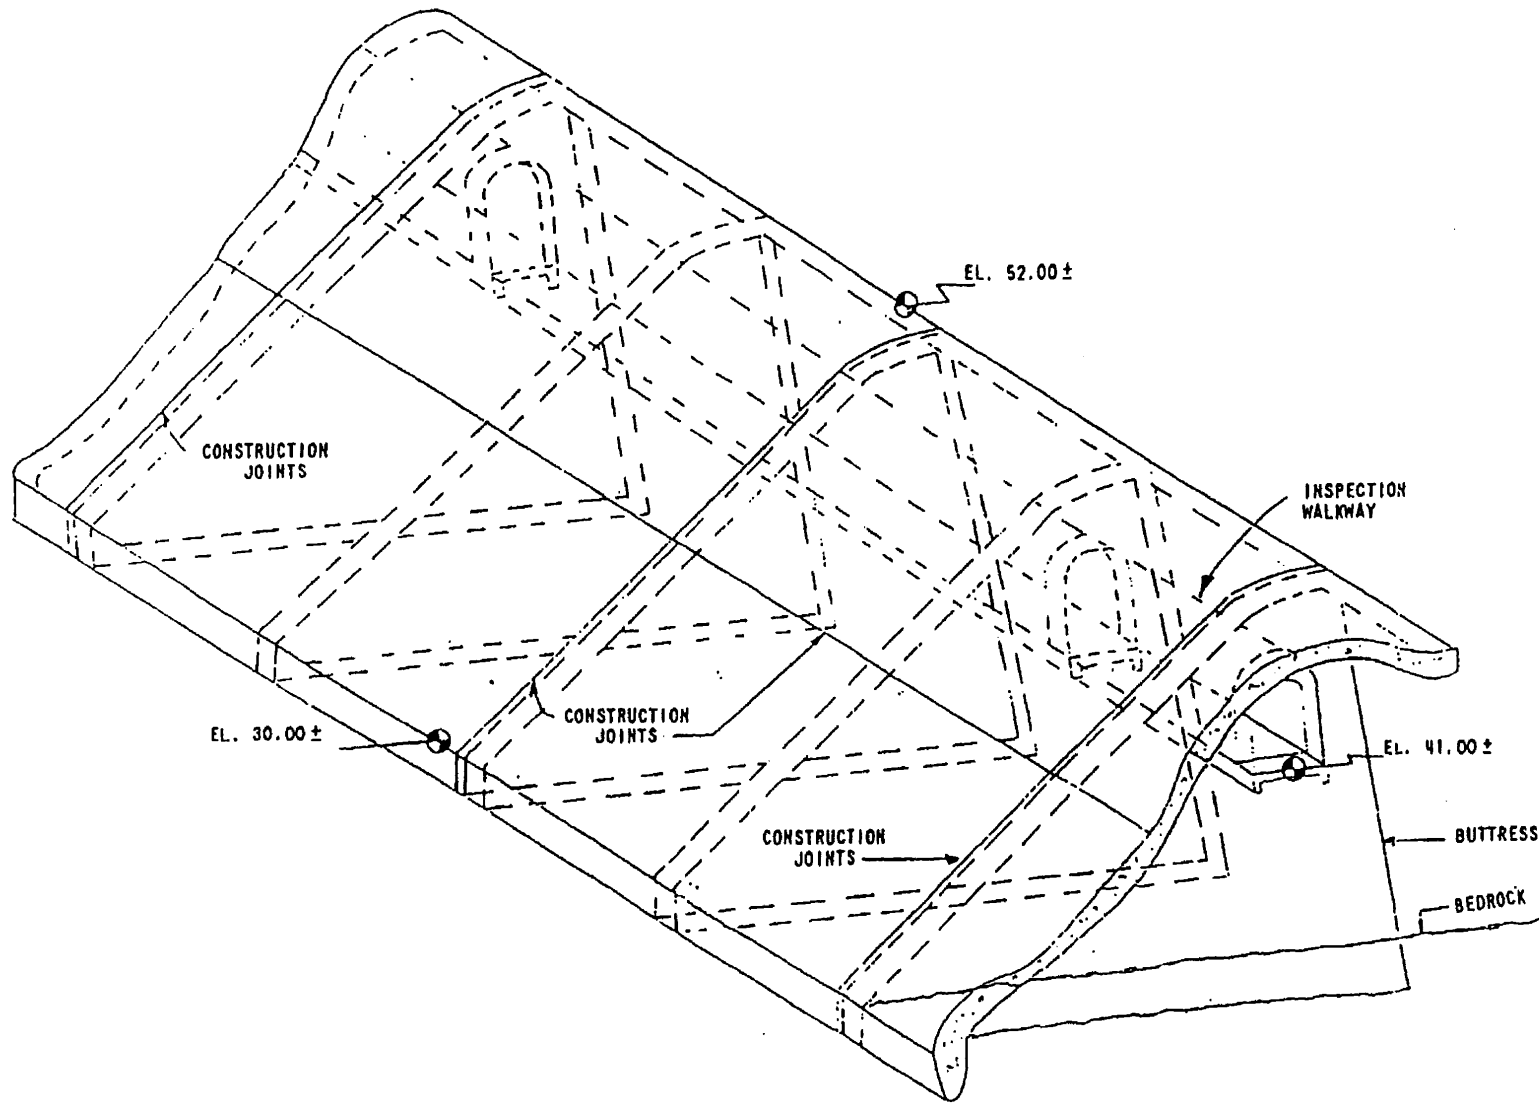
shows the general configuration of the dam, abutments, and beginning of the Rappahannock Canal. The dam is a concrete Ambursen dam design that uses slabs and buttresses and includes an inspection walkway through the dam and the abutments. Figure 4 shows an isometric representation of Embrey Dam. The southern abutment includes the headworks for the canal, a portion of the old canal and lock system, a gaging station used by the United States Geological Survey, and an ineffective Kail system fish ladder. While the dam is approximately 22' high, significant sedimentation has left only about 6 to 8 feet of water behind the dam. A crib dam is located just upstream of Embrey Dam. This type of dam was designed with crisscrossed timbers filled with earth and granular material. The crib dam was originally used as a source of water for Fredericksburg's hydroelectric facility. Embrey Dam was constructed to increase the level of the backwater and produce more hydroelectric power. The crib dam has been preserved by being submerged since the construction of Embrey Dam.
